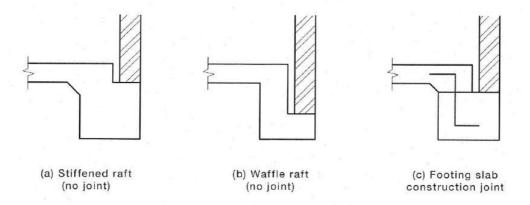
EXAMPLES OF FOOTING SYSTEMS REQUIRING NO JOINT TREATMENT
